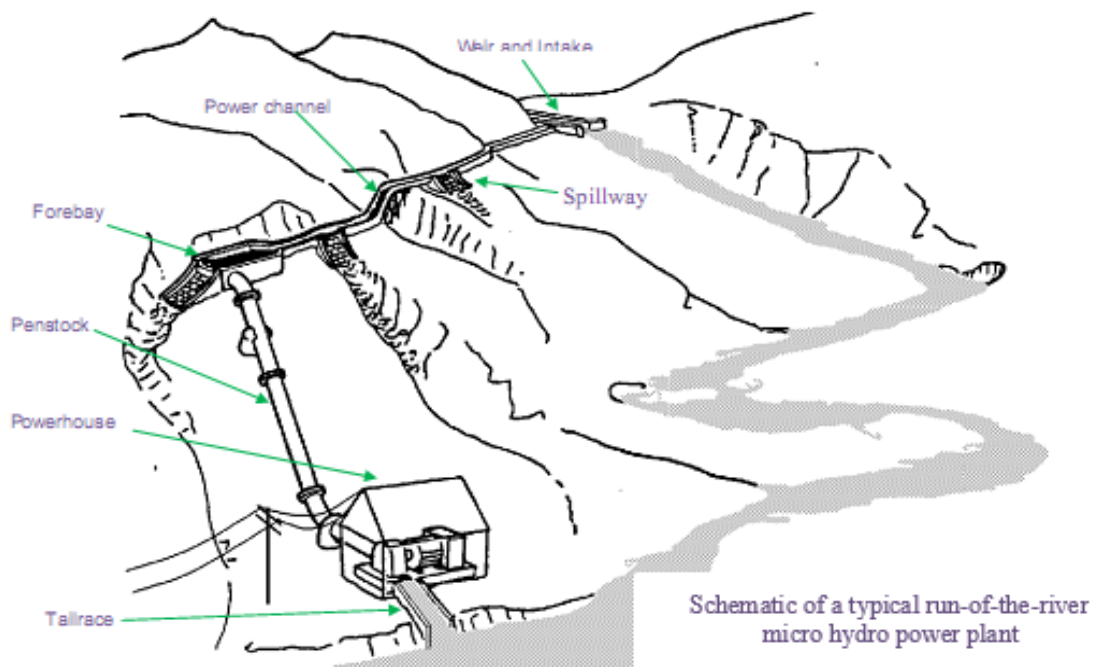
Micro hydropower plant overview (Singh, 2009)
